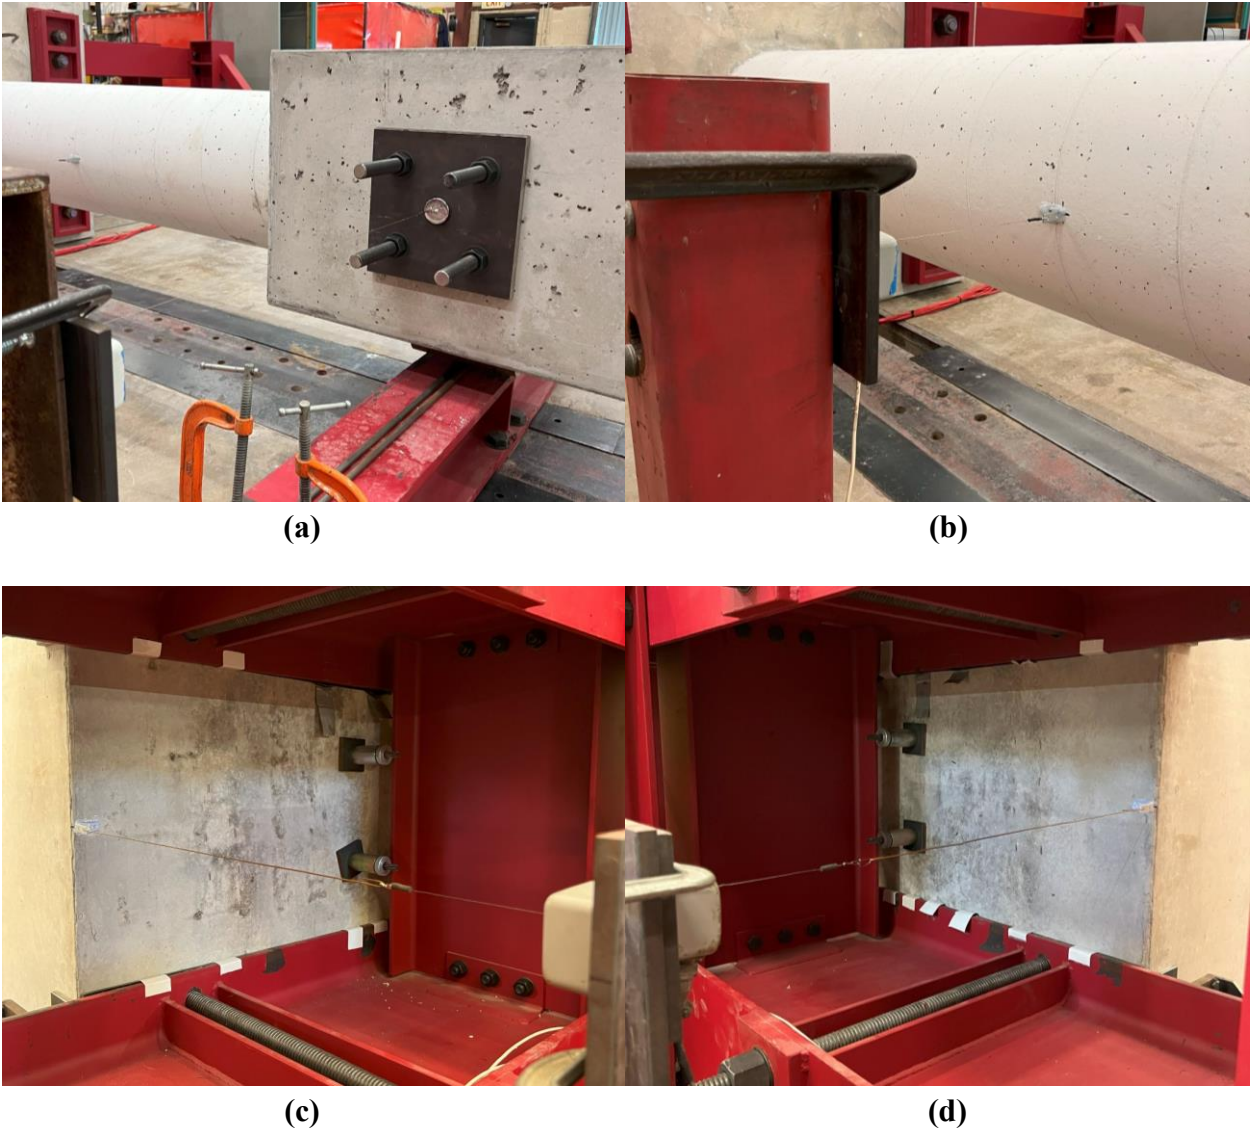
Column Specimen Instrumentation, (a) WP1 at the Column Head, (b) WP2 at the Column Midspan, (c), WP3 at the SW Base Edge, (d) WP4 at the SE Base Edge
